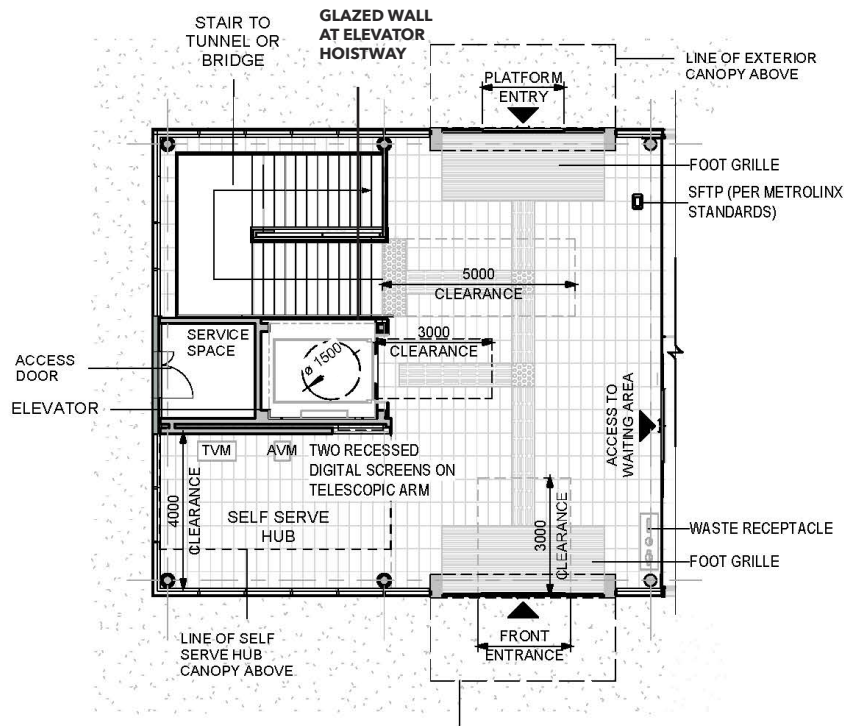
Typical Ground Floor Plan of Platform Access Module when joined to Station Ambassador Module.
